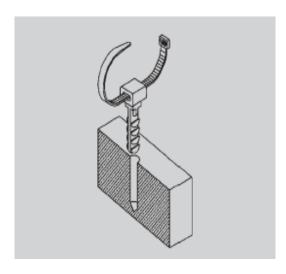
Assembly base for cable fixings (FTH 20)
